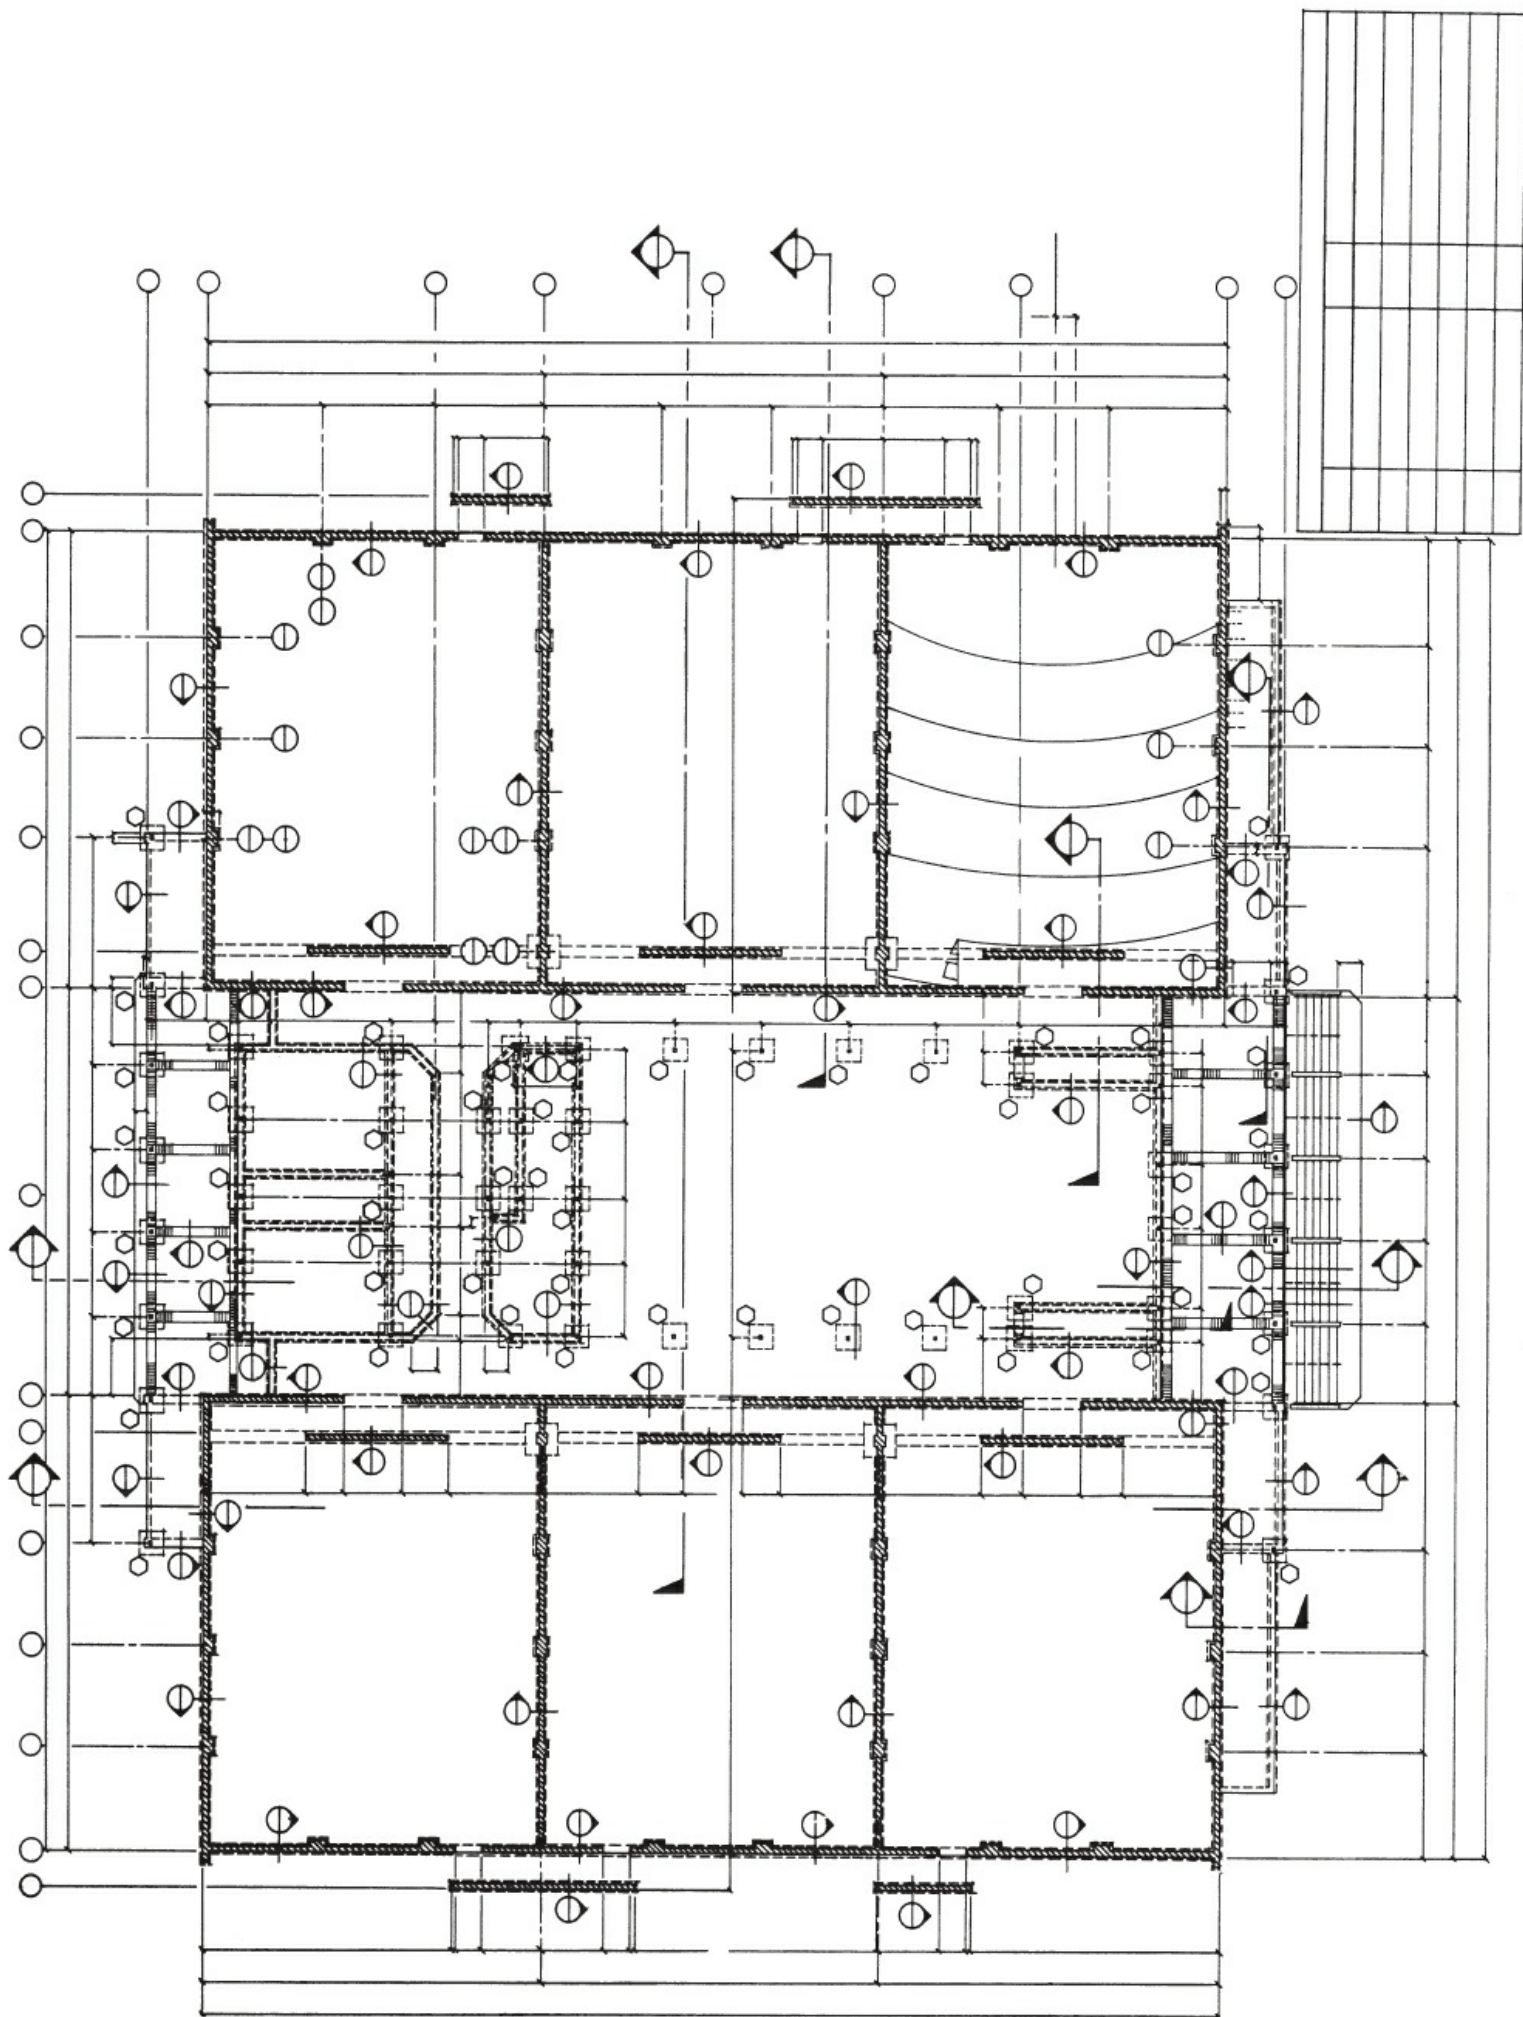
Clay Theater—Stage II: Working drawing—foundation plan.
